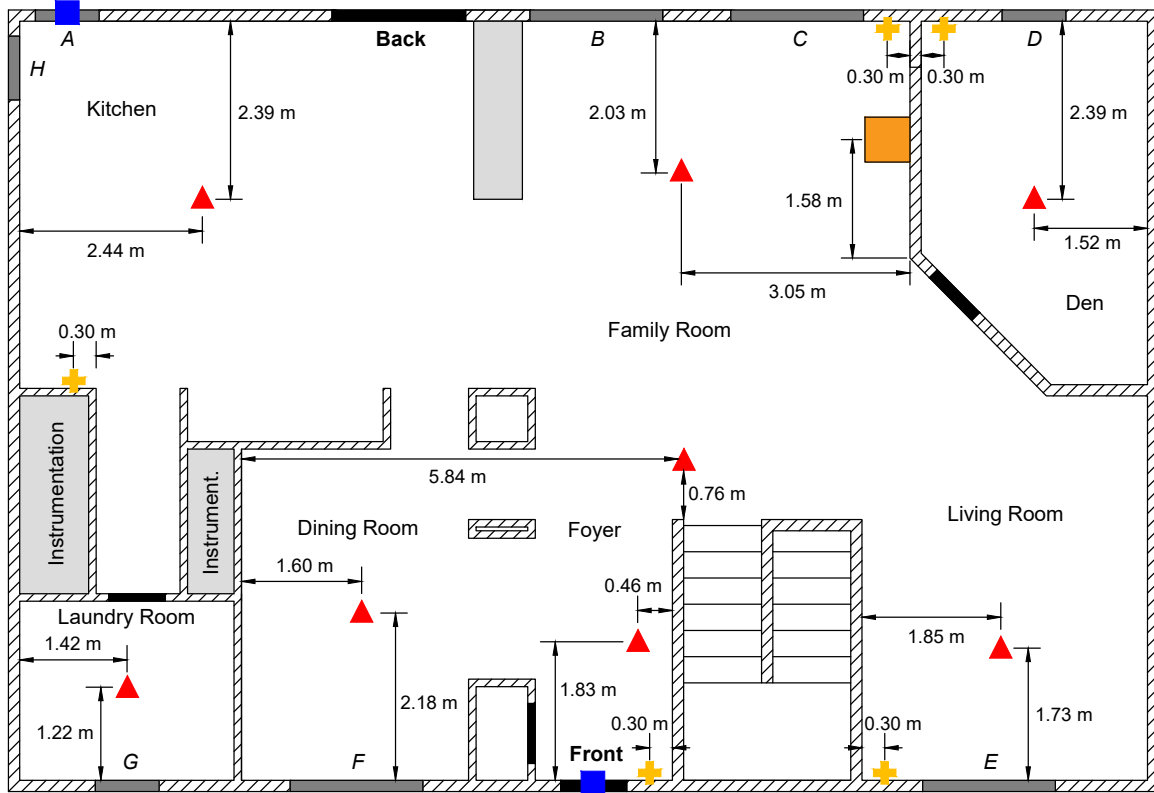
Dimensioned plan view drawing of instrumentation of the first story of the two-story structure
